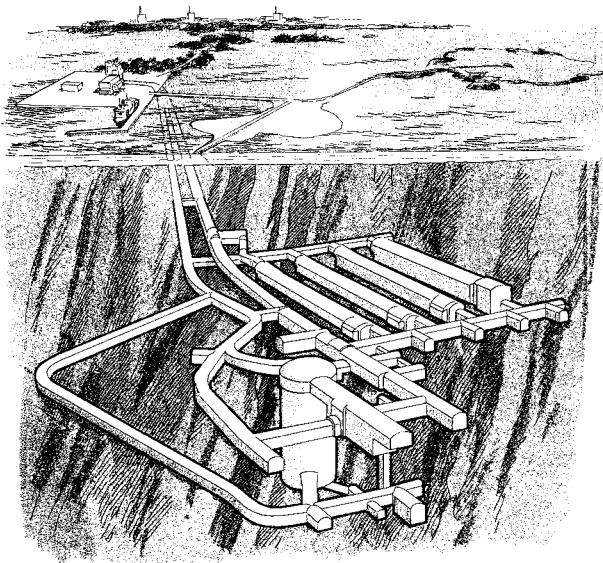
Overview of tunnels and storage chambers in the first construction stage of SFR.
